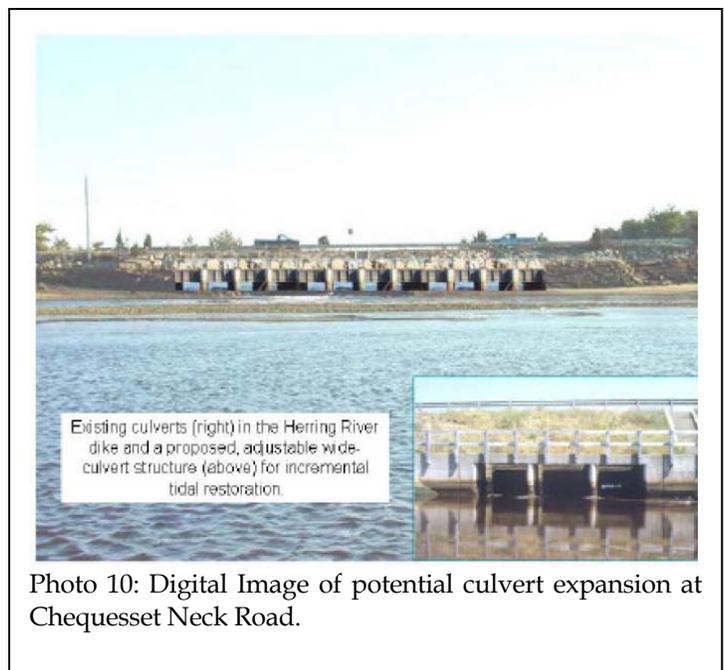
Digital Image of potential culvert expansion at Chequesset Neck Road.
